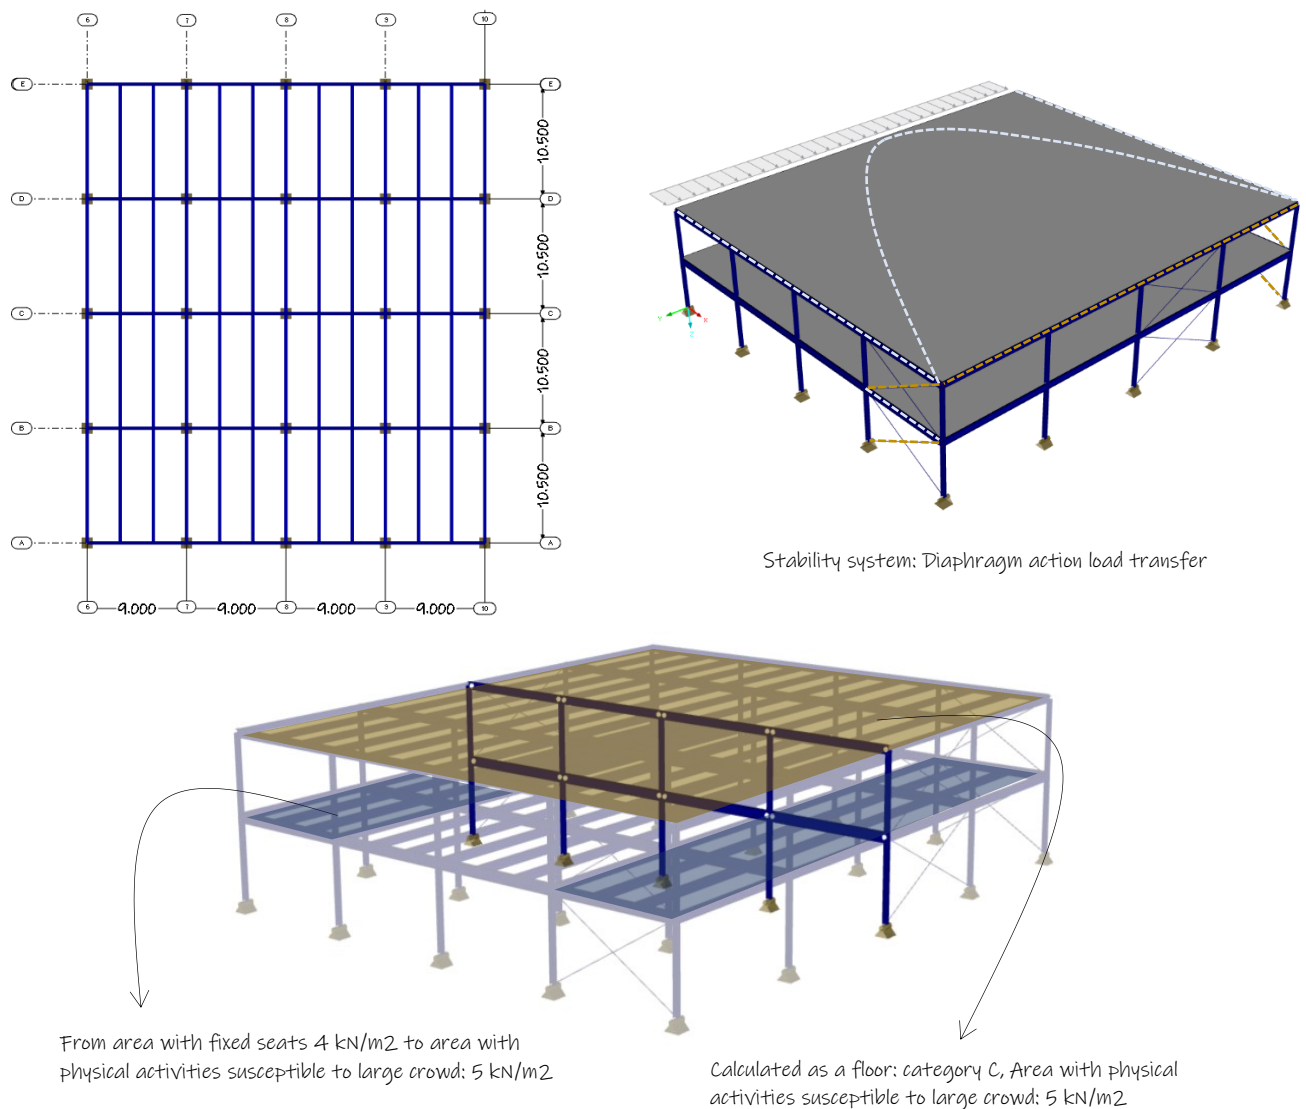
Convertible design conceptual structural overview: floor plan, and stability system and structural consideration on surplus capacity.
